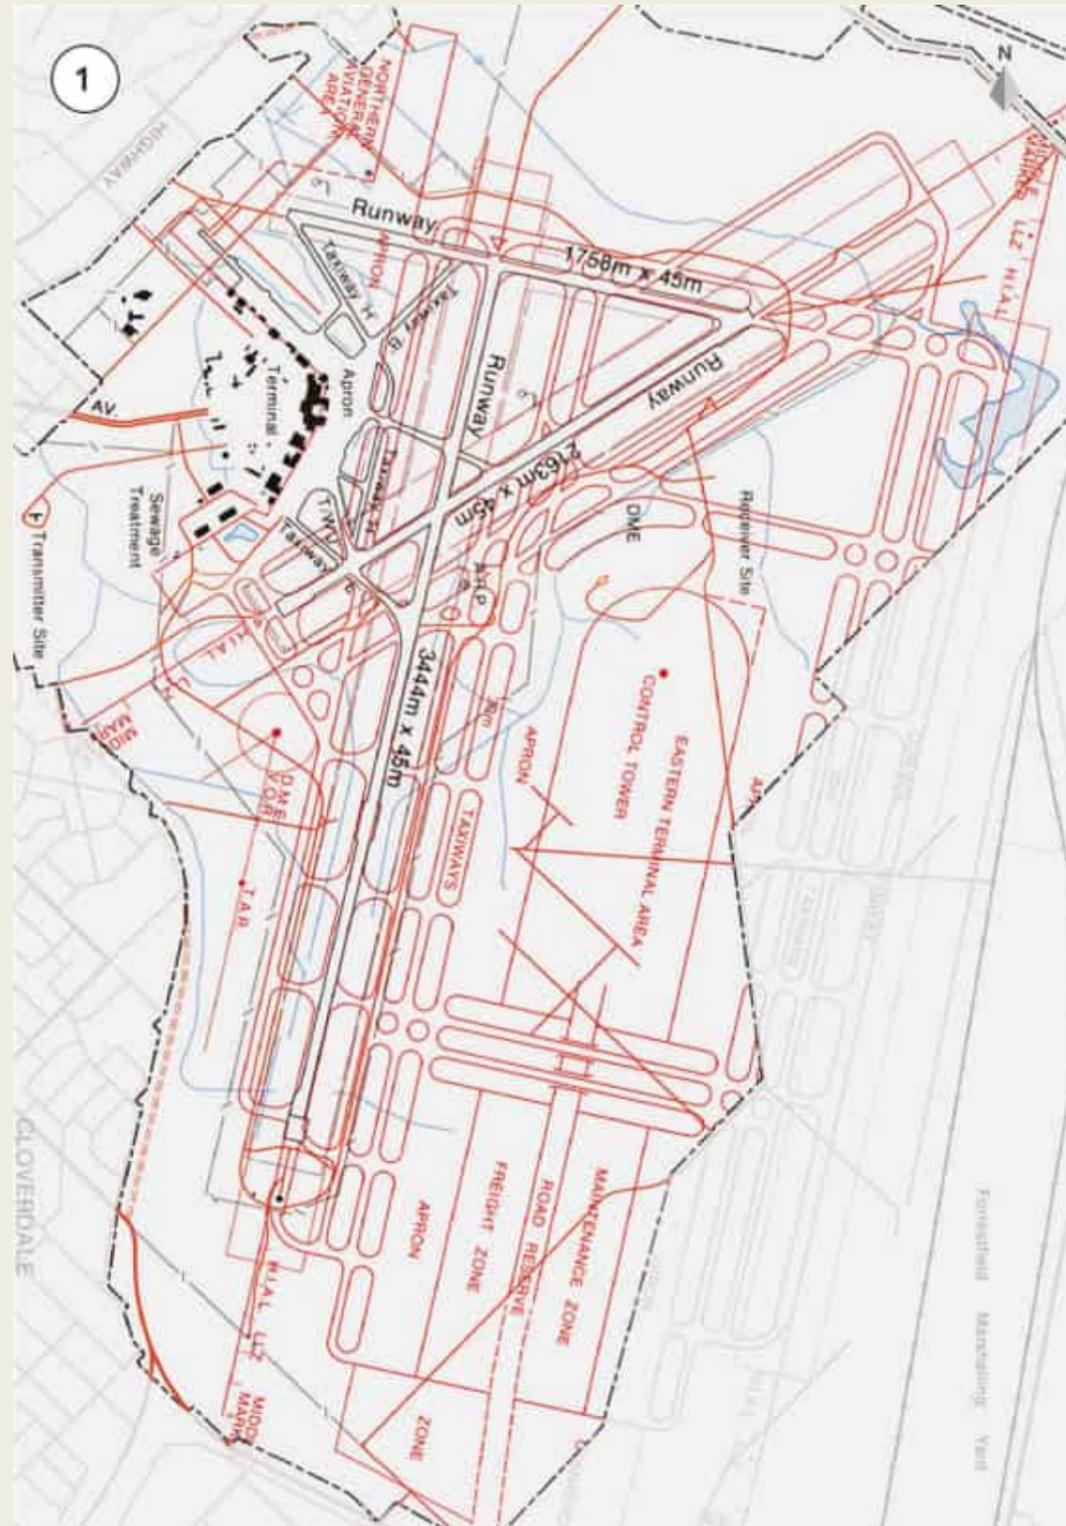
Perth Airport Master Plan 1985-future development plan
